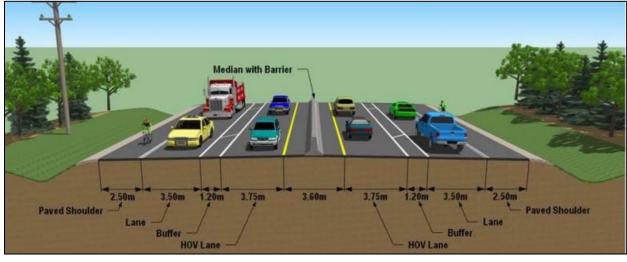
Hwy 174 Widening Potential Cross-Section East of the Site
